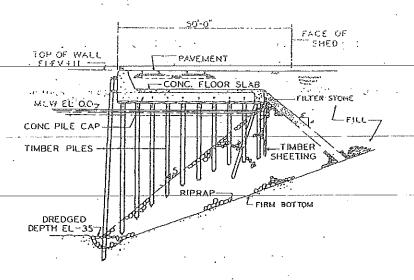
Open-type wharf substructure with concrete relieving platform. (Courtesy The American Association of Port Authorities.)
